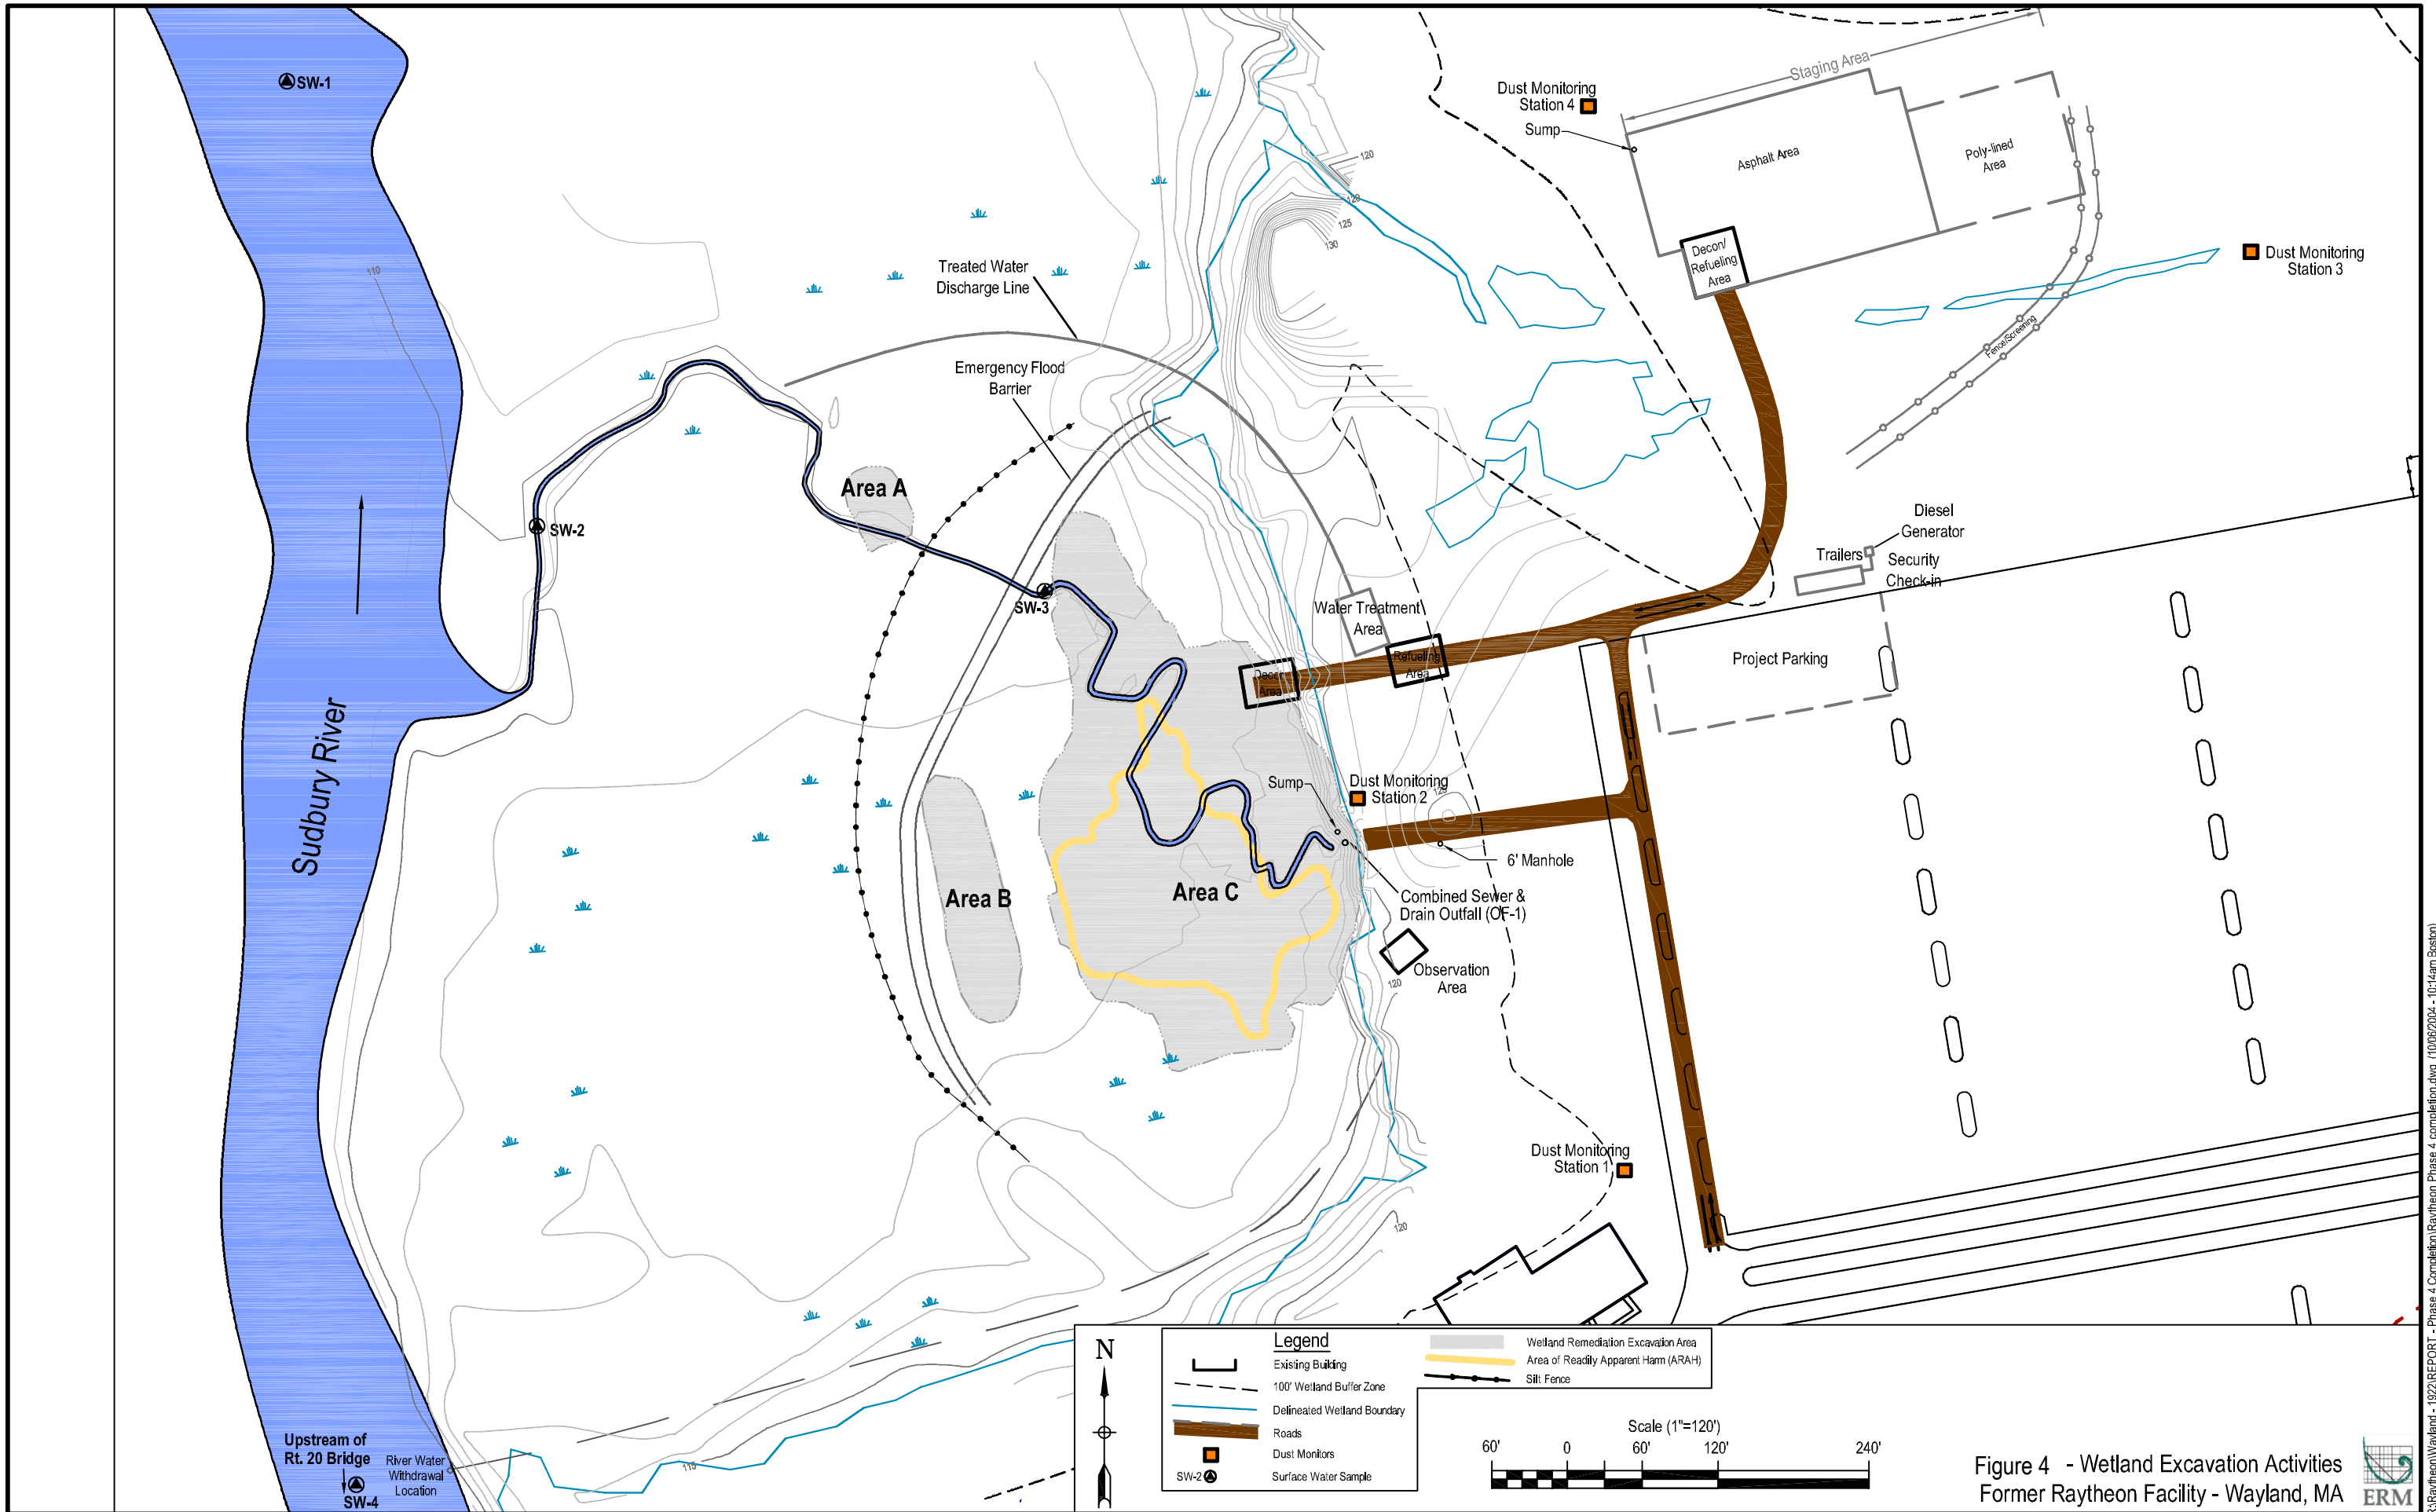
Wetland Excavation Activities Former Raytheon Facility - Wayland, MA
